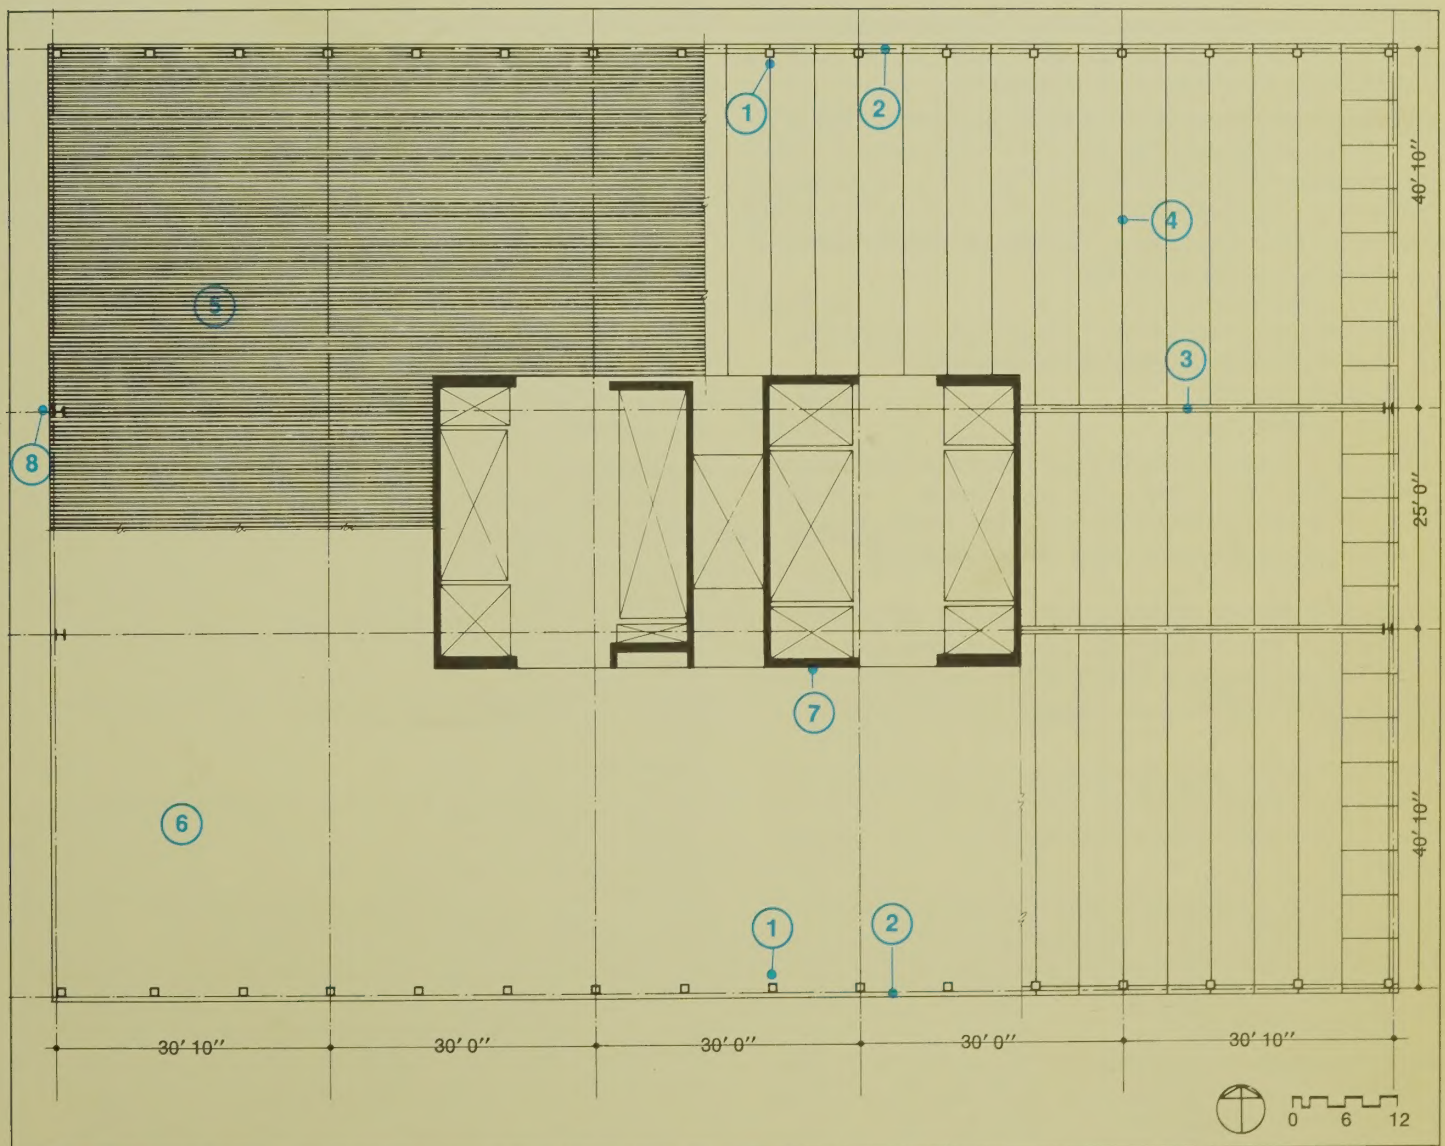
Stelco Tower column spacing and typical lower floor plan. The east bank of elevators terminates at the 14th floor as shown in figure 9.
